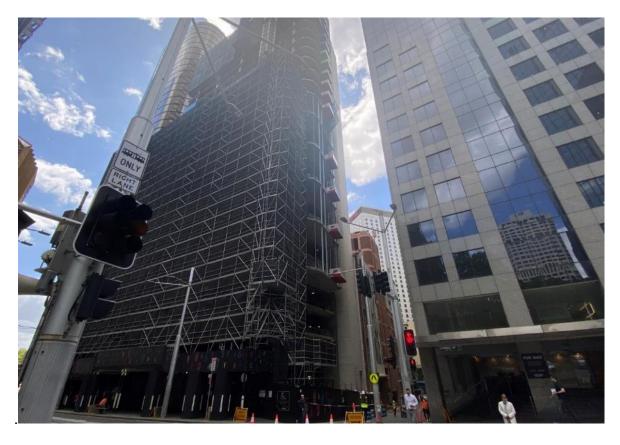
New commercial tower currently under construction located to the west of the site viewed from George Street
